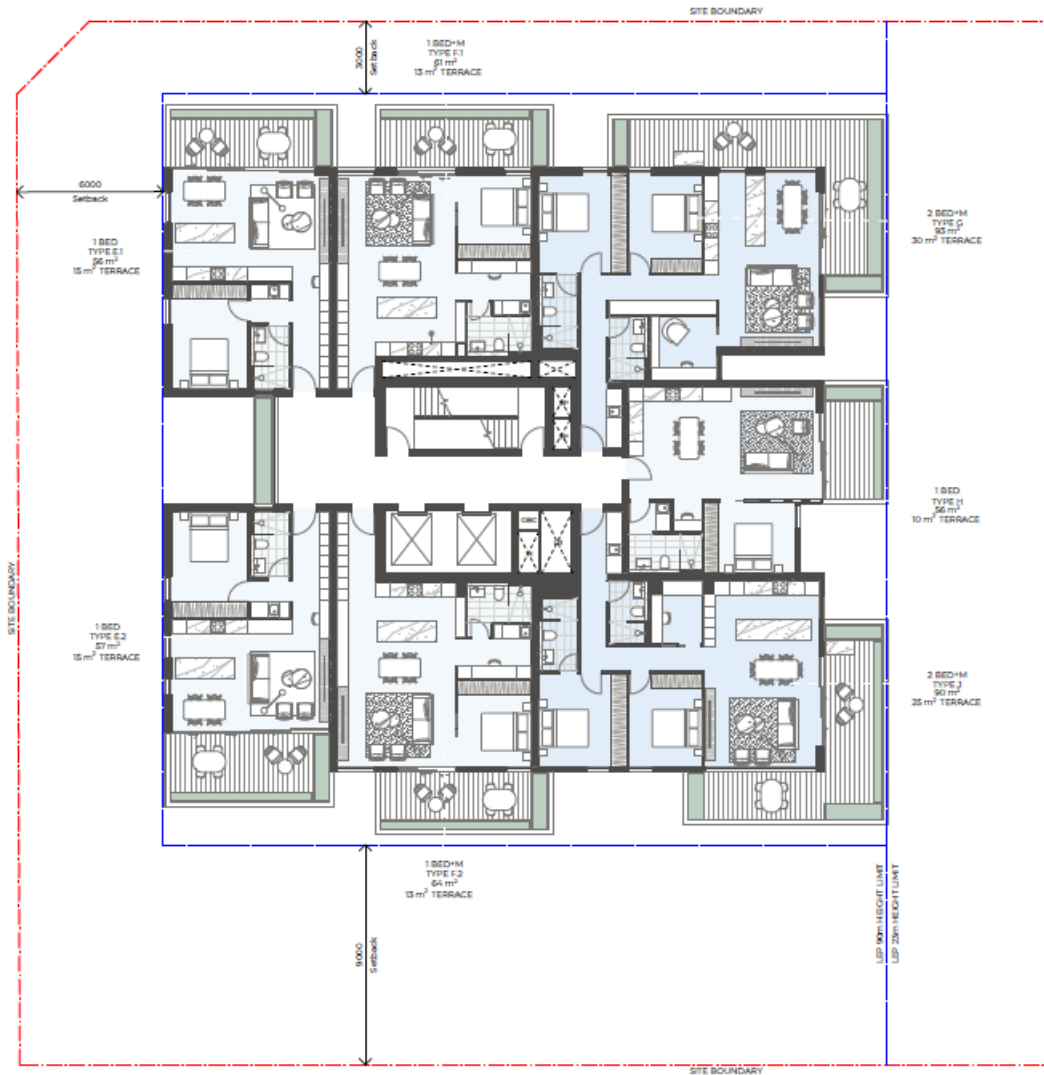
GROUND FLOOR PLAN – PREFERRED OPTION
